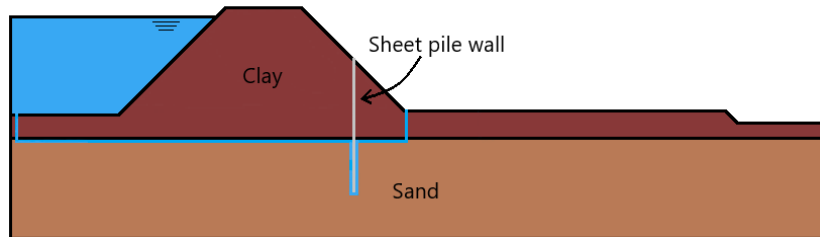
Construction of a sheet pile wall to increase seepage length.
